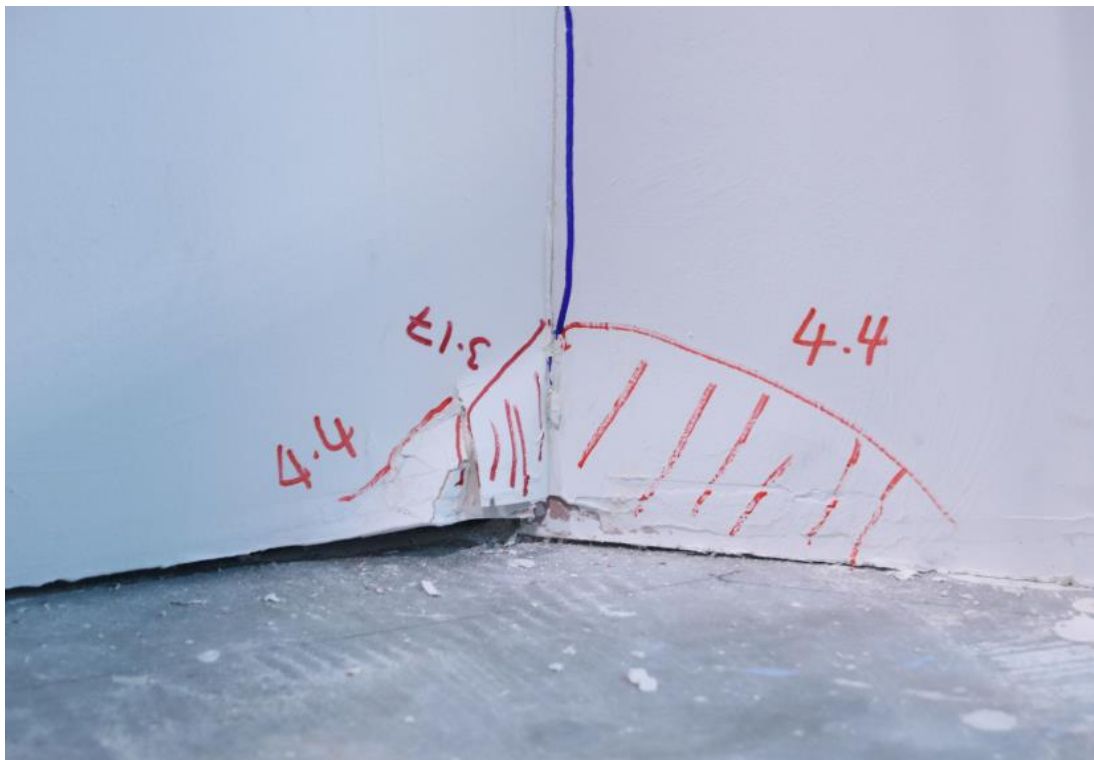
Specimen B1 – Step 15 –DS2a: Damage to wallboard at Y-junction – location 19
